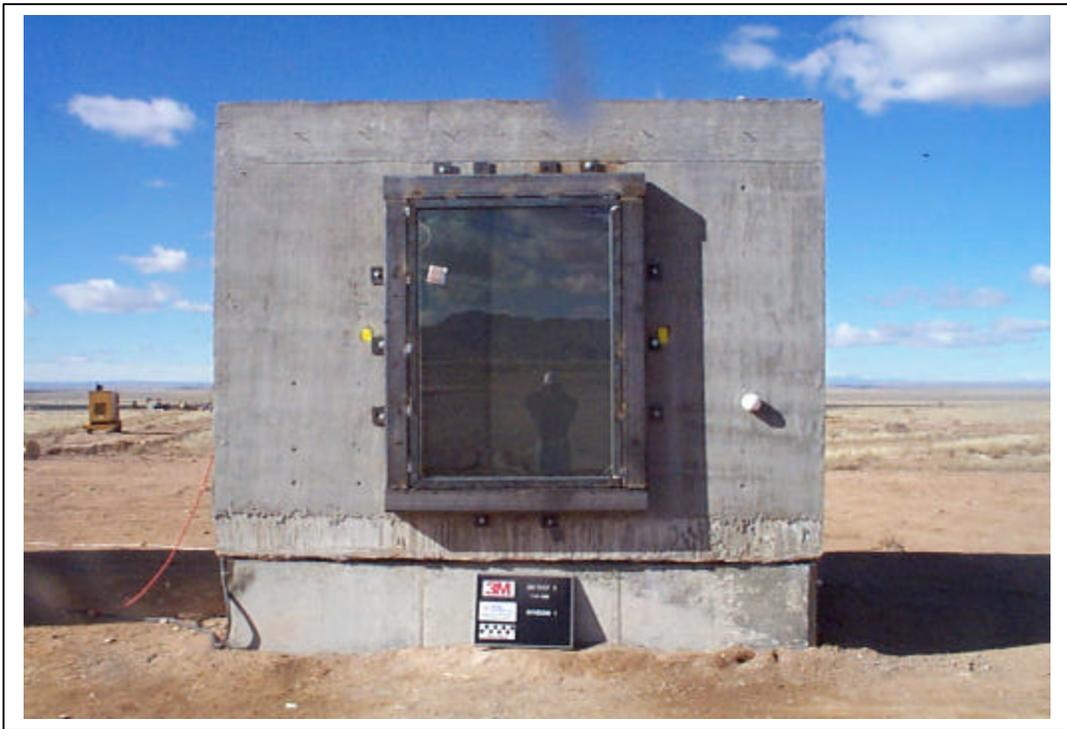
Test 3. Pretest, exterior view of window 1 (test3\_14.jpg).
